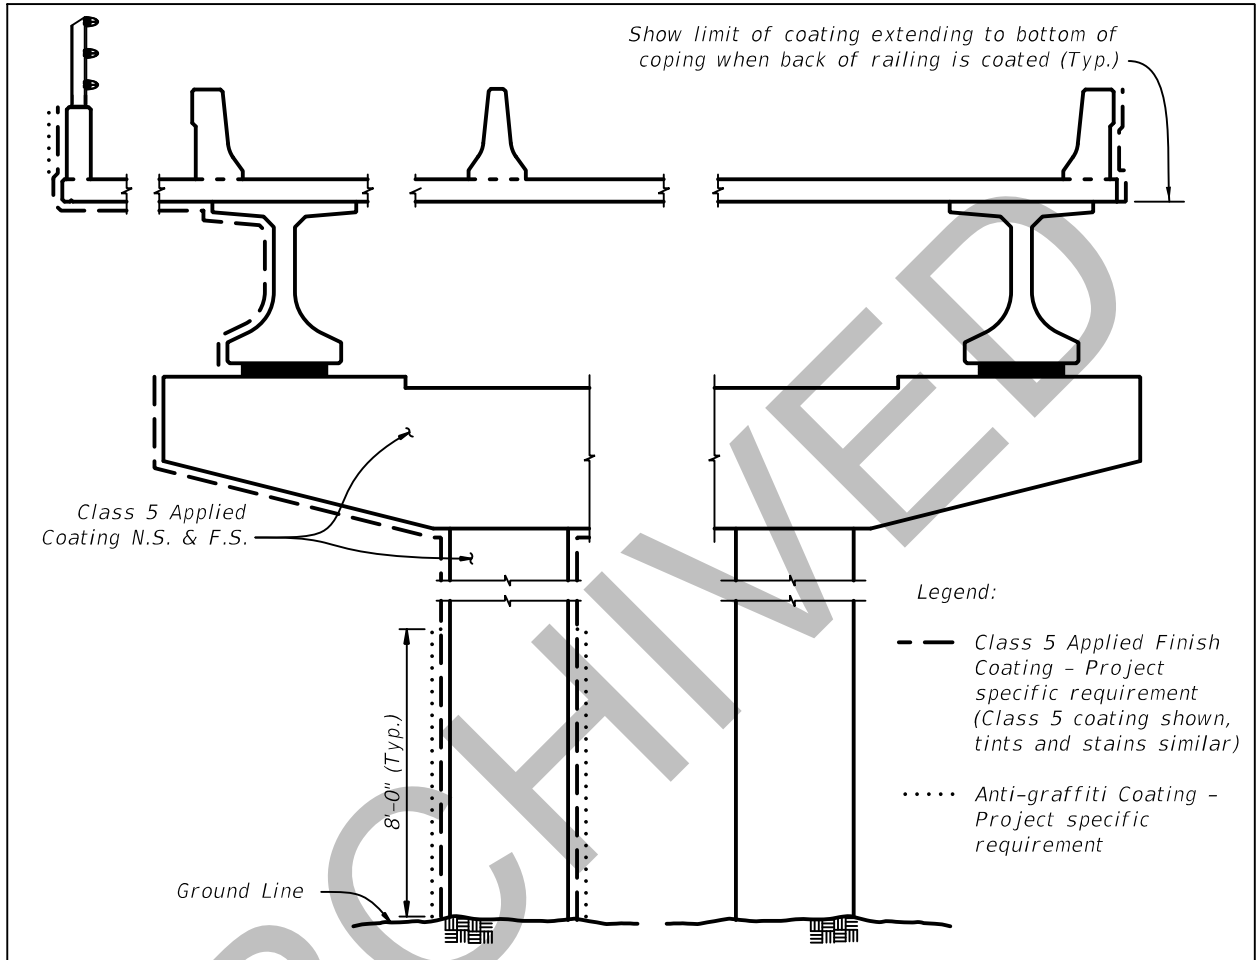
Example Surface Finish Depictions on Waterway Crossings and Railroad Separation Structures
